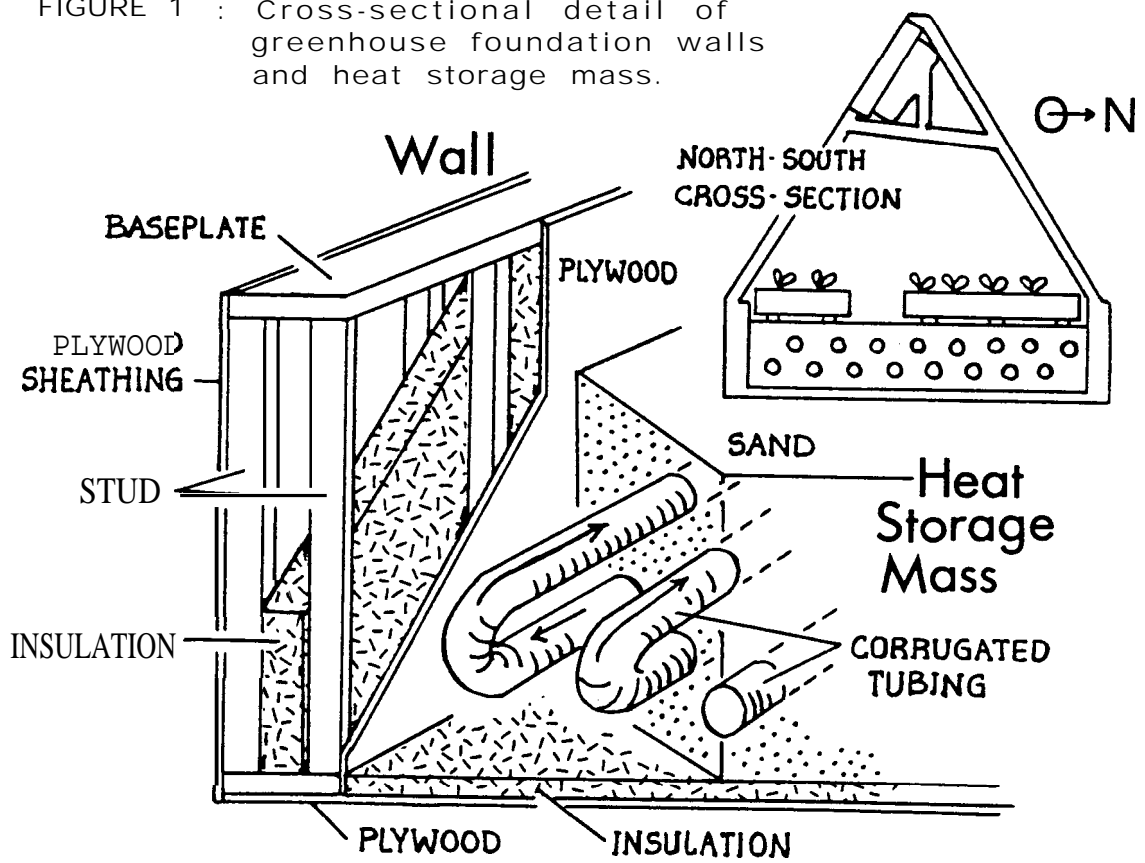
Cross-sectional detail of greenhouse foundation walls and heat storage mass.
